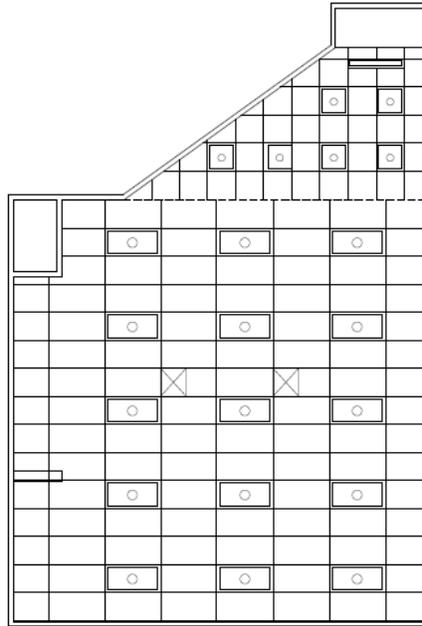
Hoover Elementary Room 1 Reflected Ceiling Plan
